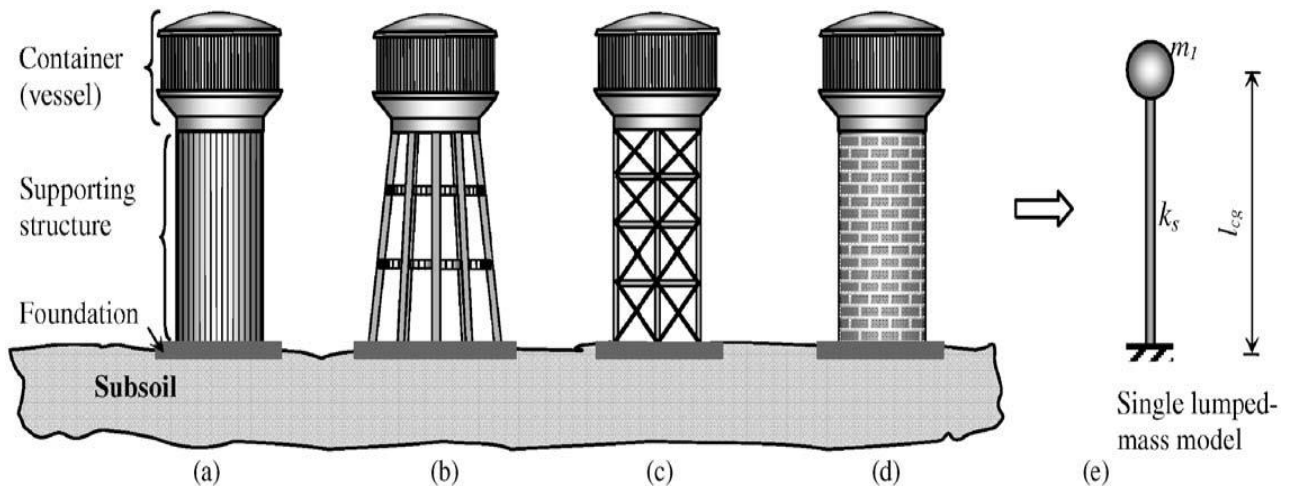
Elevated tanks and the single lumped-mass model: (a) the tank with reinforced concrete shaft supporting structure, (b) the tank with reinforced concrete frame supporting structure, (c) the tank with reinforced concrete frame with diagonal braces or steel frame supporting structure, (d) the tank with masonry pedestal supporting structure, (e) single lumped-mass model.
